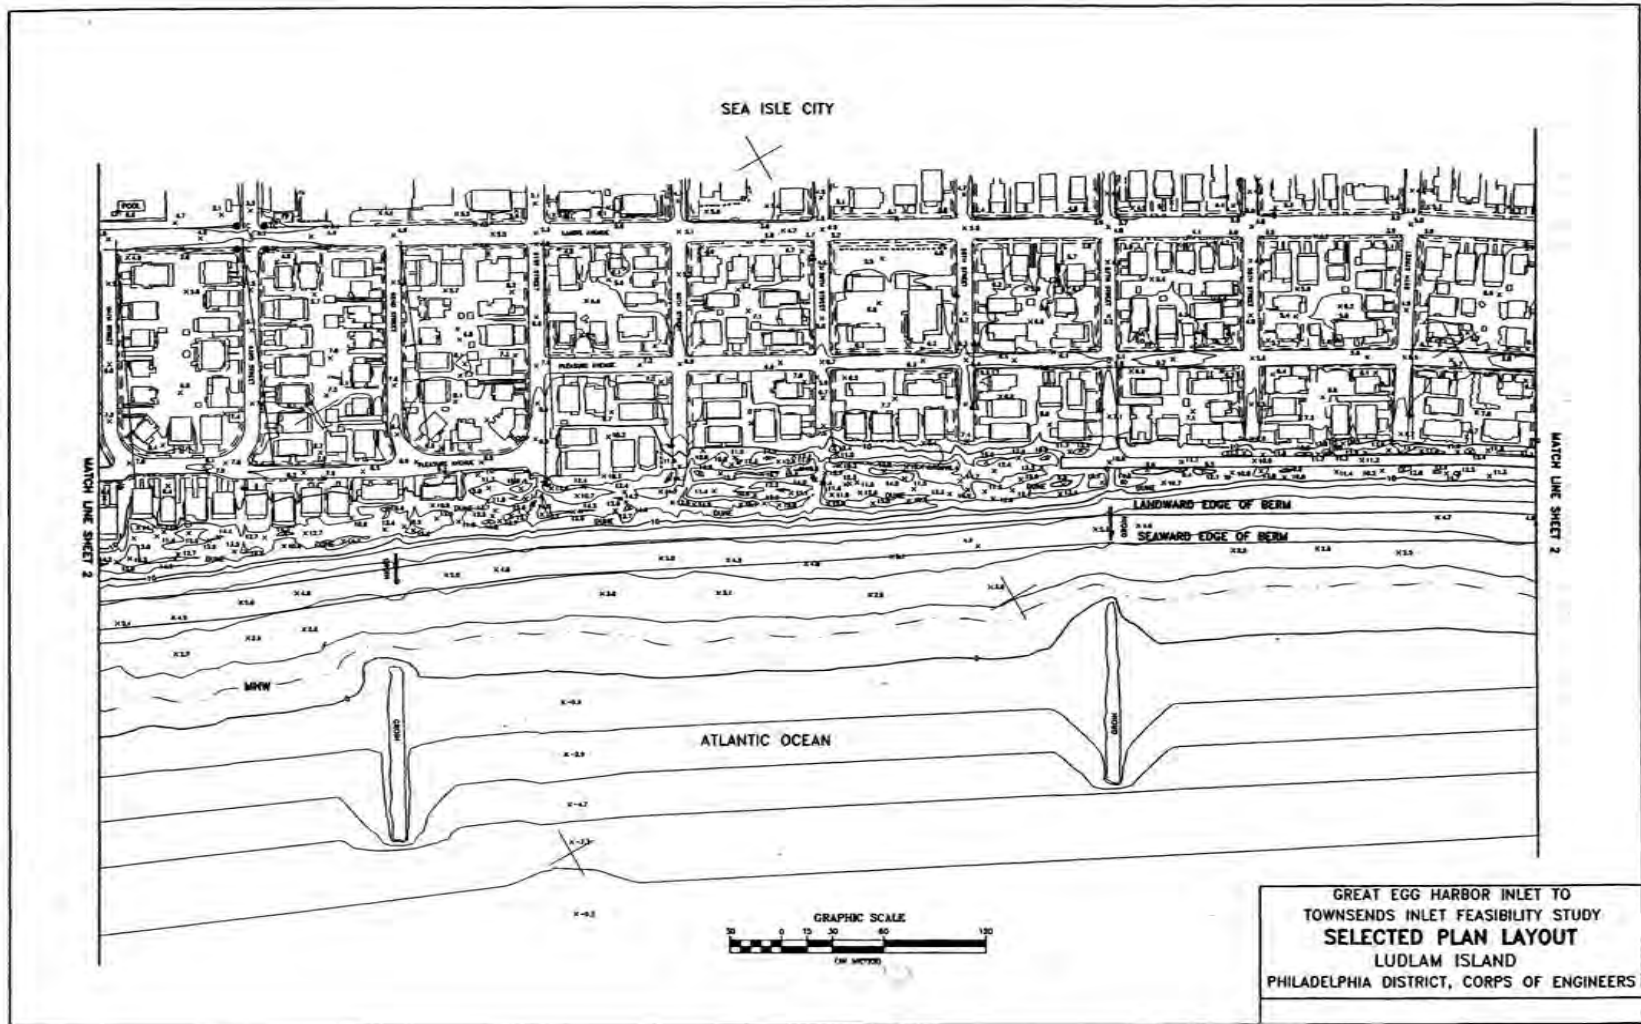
Selected Plan Layout for Ludlam Island, NJ – 55th Street to 64th Street, Sea Isle City
